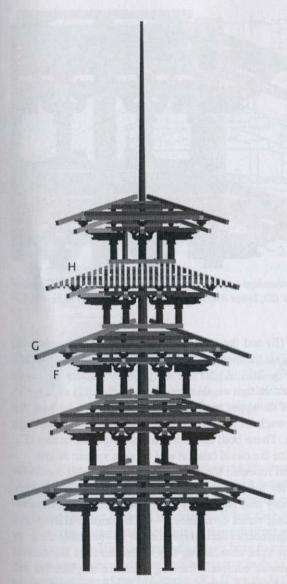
The complete outer structure, including lower and upper roof rafters (F and G). The fourth story in this image also shows roof battens (H), which are the substrate for final weatherproof roofing surface materials. Note that while several elements completely surround the core, not one element of the structure shown here yet touches it directly.
